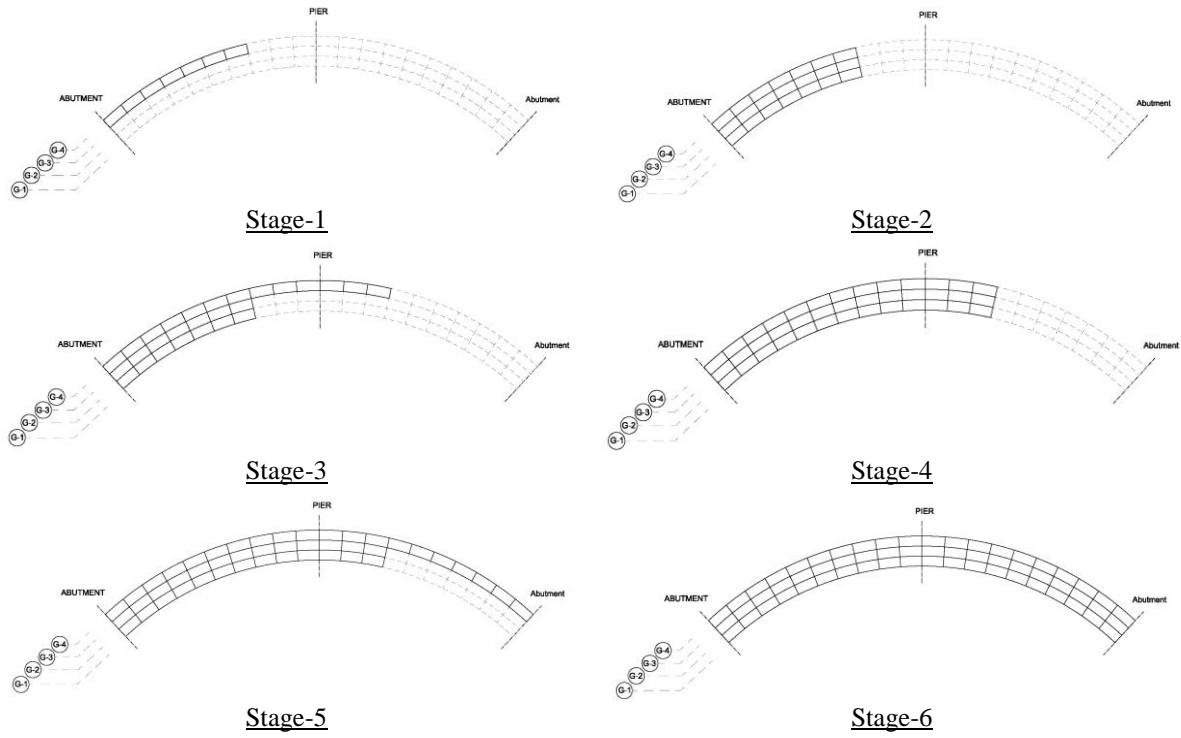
Stage 1 to Stage 6 for Paired-Girder (outer girders placed first) Erection of Two-Equal-Span, 4-Girder Bridges.
